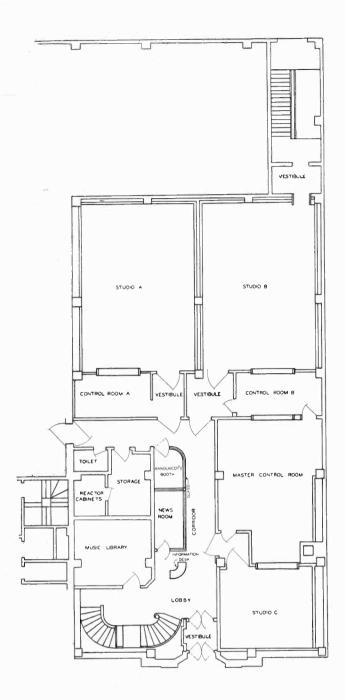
(left) Arrangement of first floor of the new WBAL installation. Four studios are on this floor; the twin studios, A and B, each with its own control room; a smaller studio C, controlled from a 76-B consolette in the master control room; and an announcer's booth or "studio" which is glassed-in just off the news room.
